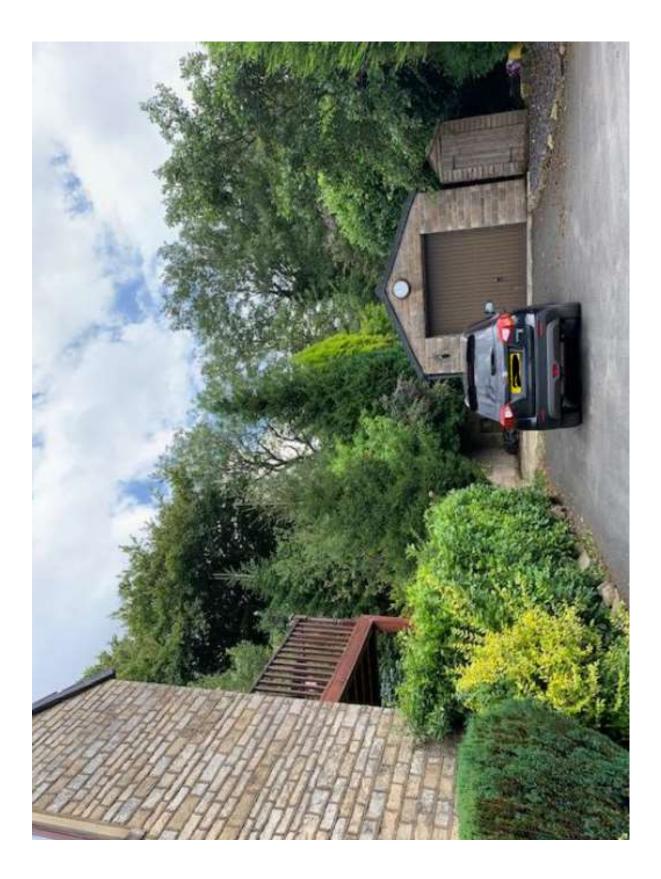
Existing rear elevation showing suspended rear balcony and conservatory
